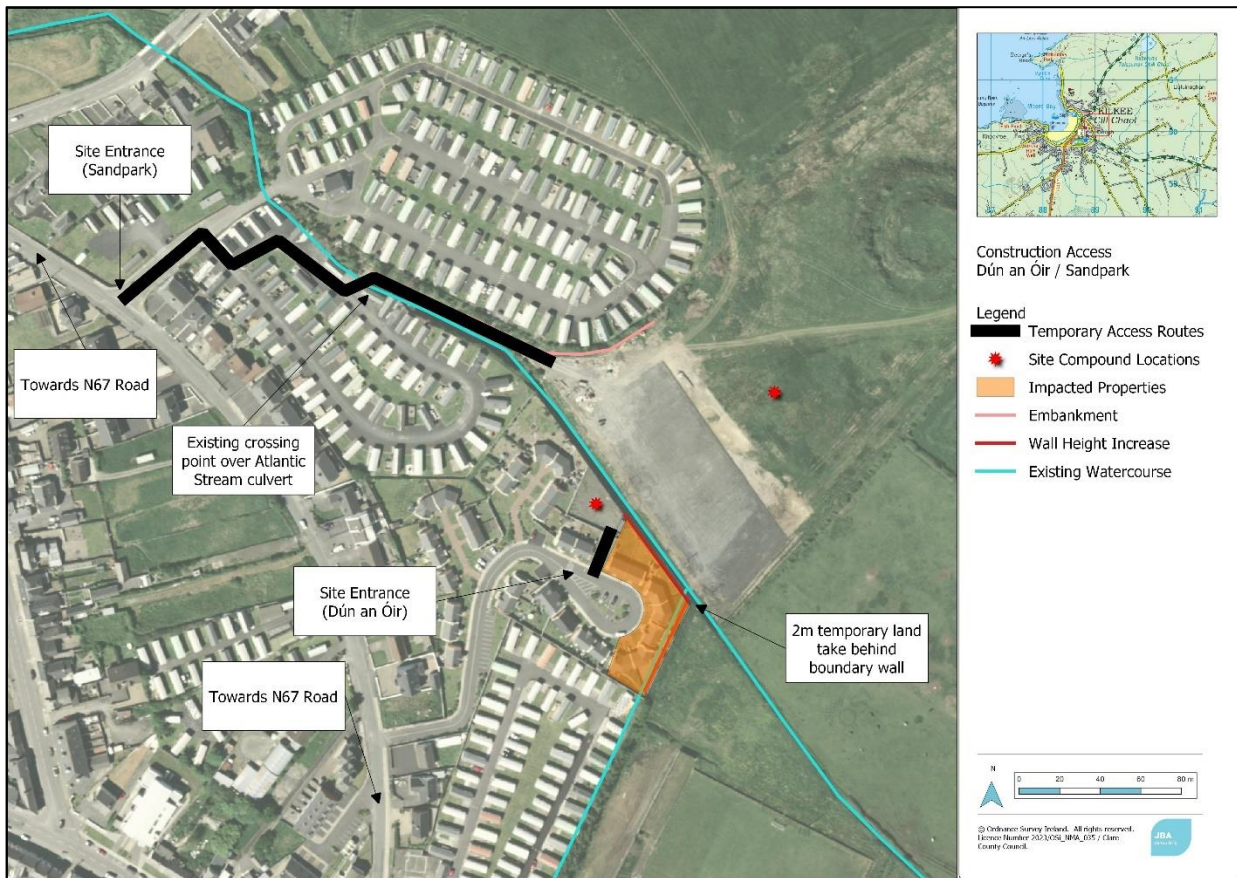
Dun an Óir Walls - Temporary Works Requirements
